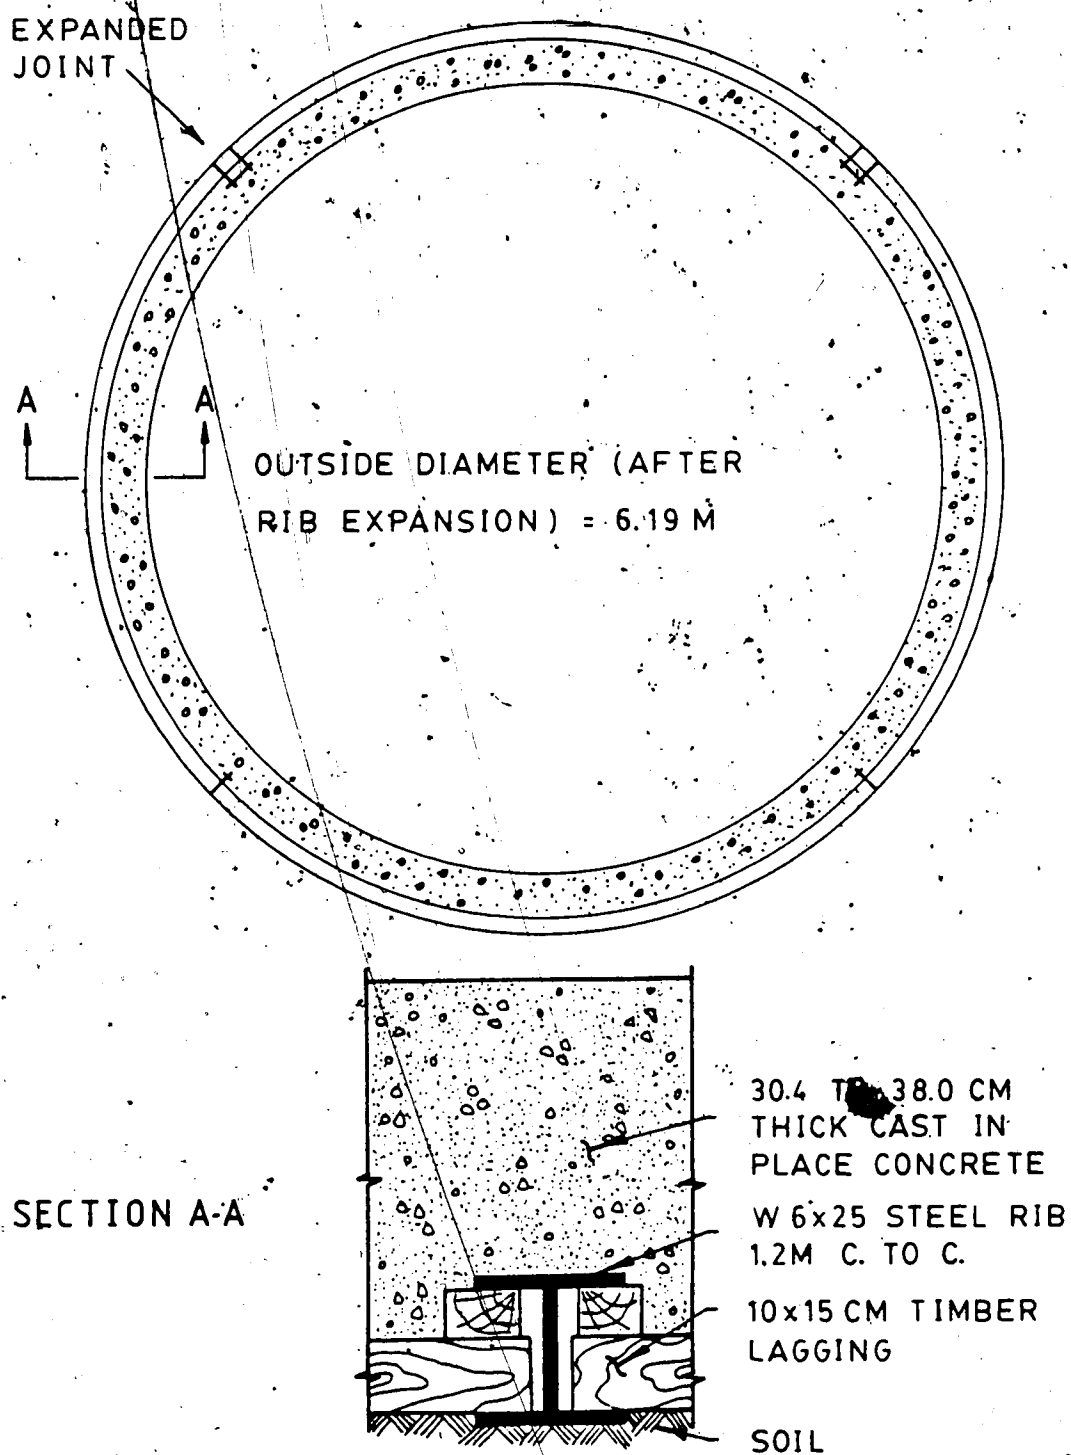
L.R.T. TUNNEL LINING SYSTEM
